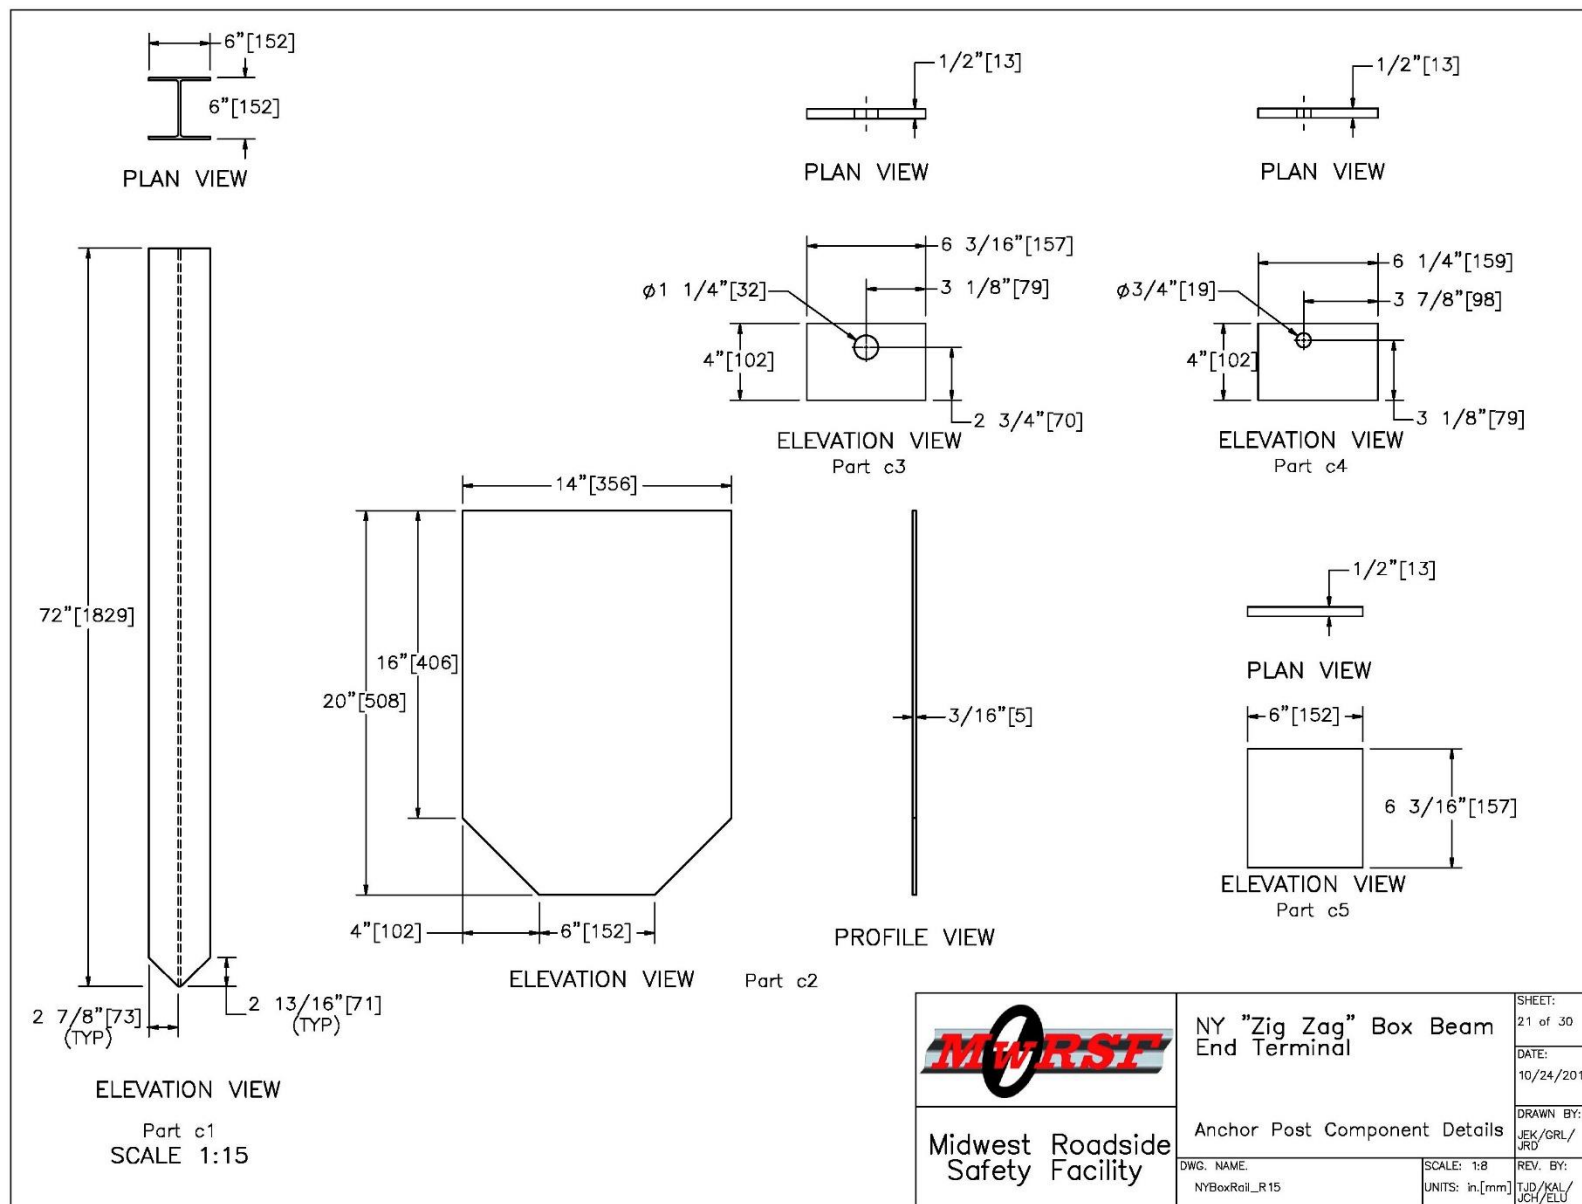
HFT Anchor Component Details, Test No. NYT-1
